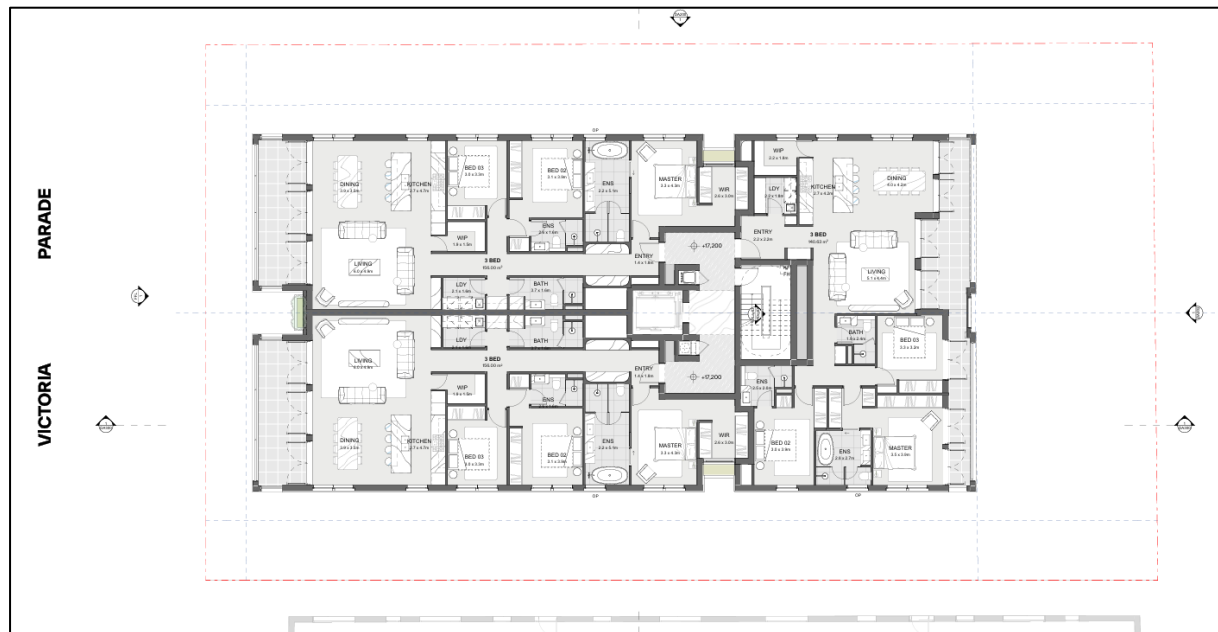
Floor Plan for Level 4 (Source: PBD Architects, 2026)
